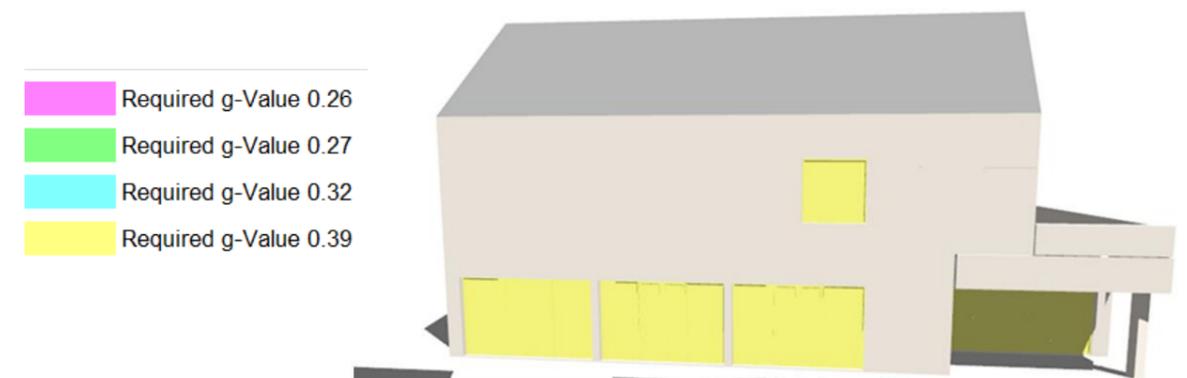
West Elevation – Required Solar Performance for Glazing
